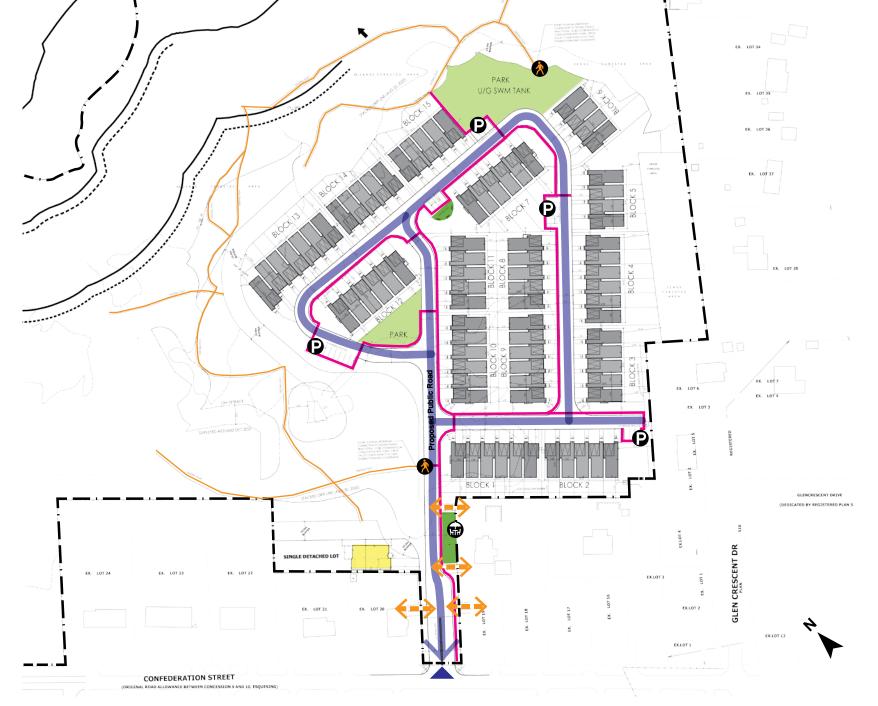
Site Circulation Diagram - Site Plan Prepared by RN Design and Annotated by Weston Consulting
